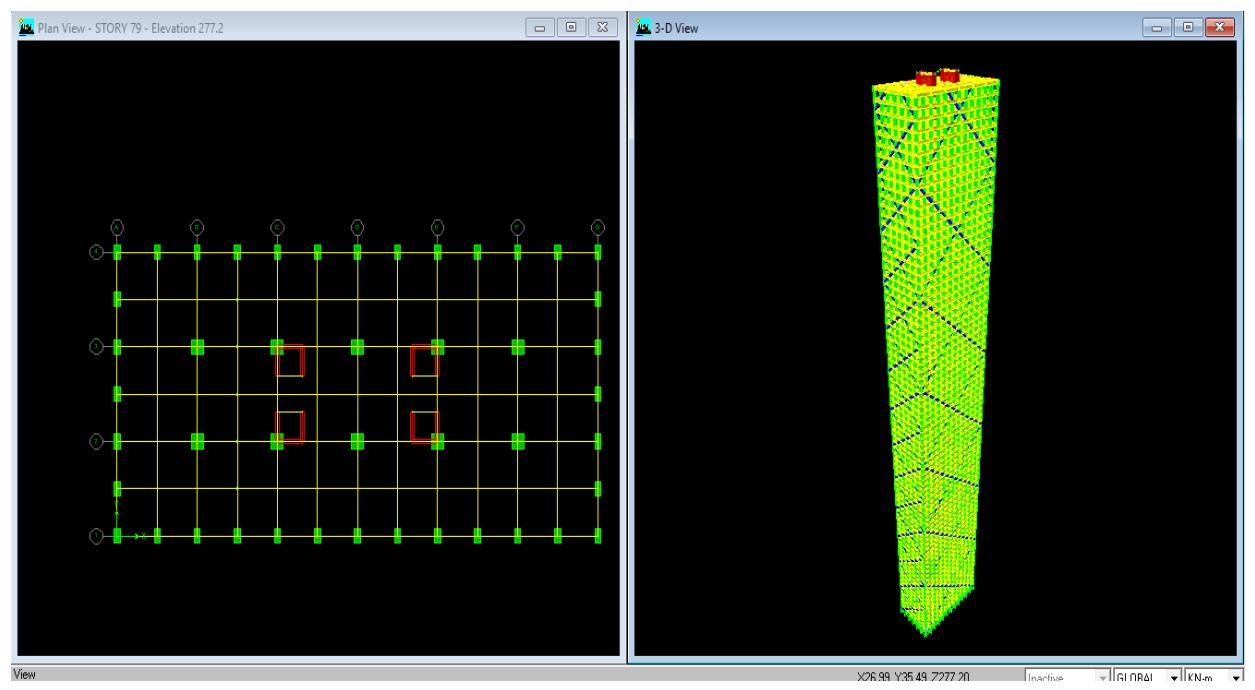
Plan view and 3-D view of 80 storied Braced Tube structure building
